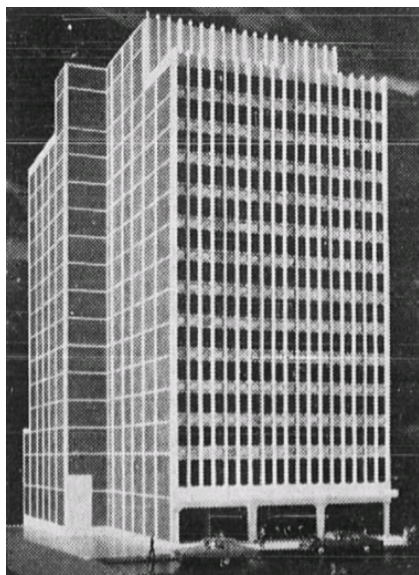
Rendering of 95-99 York Street, Sydney, built in 1970 using same precast concrete moulds. The secondary elevation to 168-172 Clarence Street also features same panels. The lower section of York Street façade has been since altered. (Source: *Sydney Morning Herald* 21 July 1969:54)
